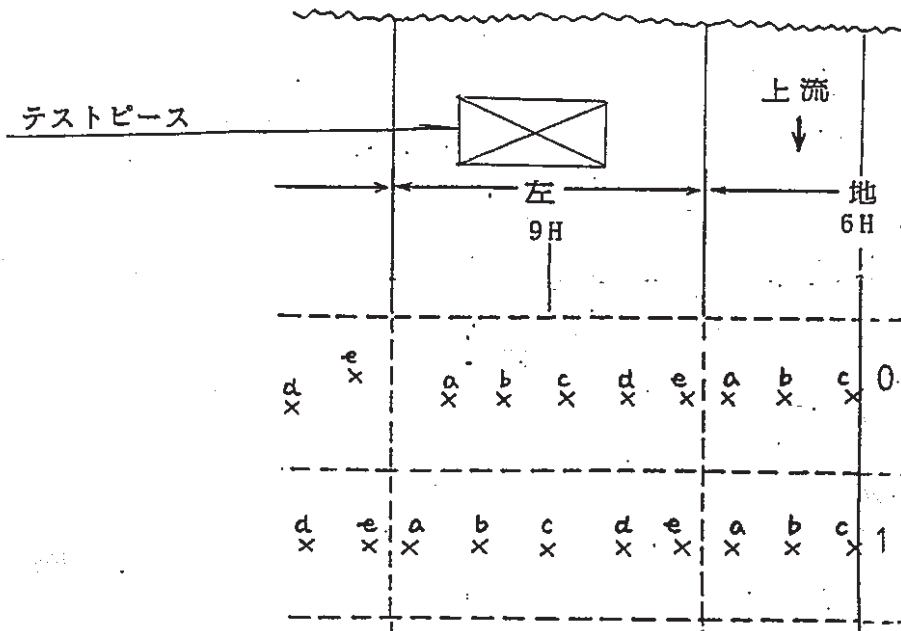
3 1 Cutting Positions of Testpieces (Hasune)
